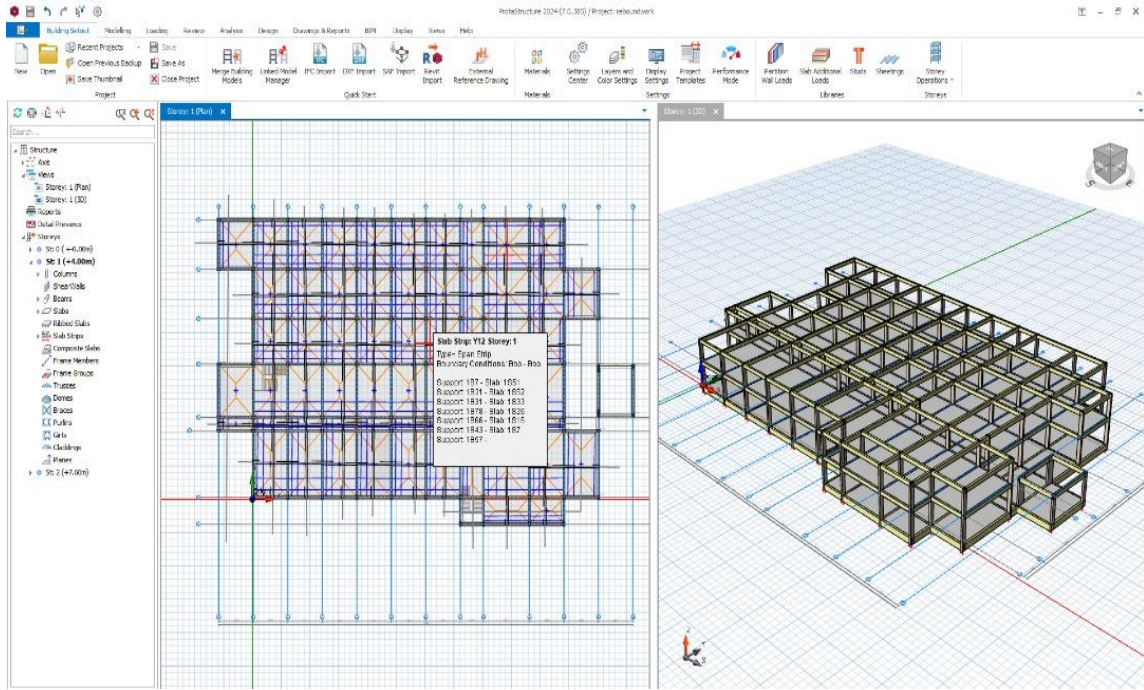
ProtaStructures design showing Structural Plan And 3D Model for the Study Building
